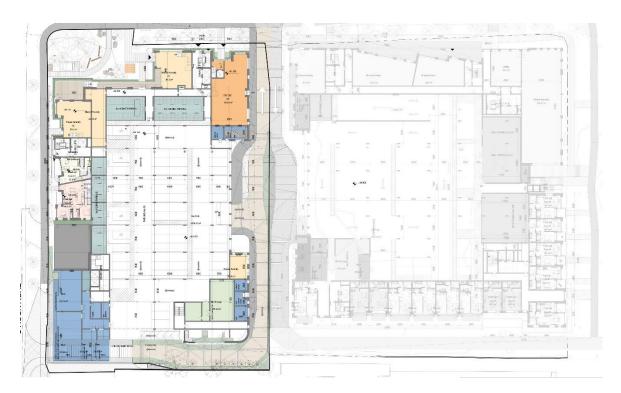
Parking Layout at Lower Ground Level (56 spaces)
